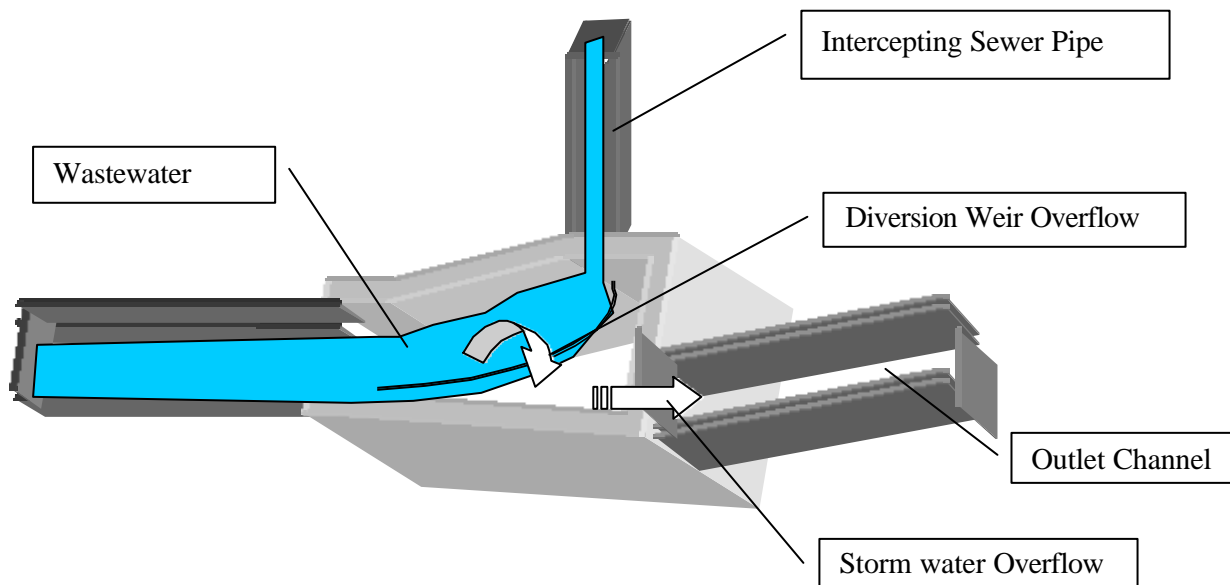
SCHEMATIC OF DIVERSION WEIR MANHOLE
